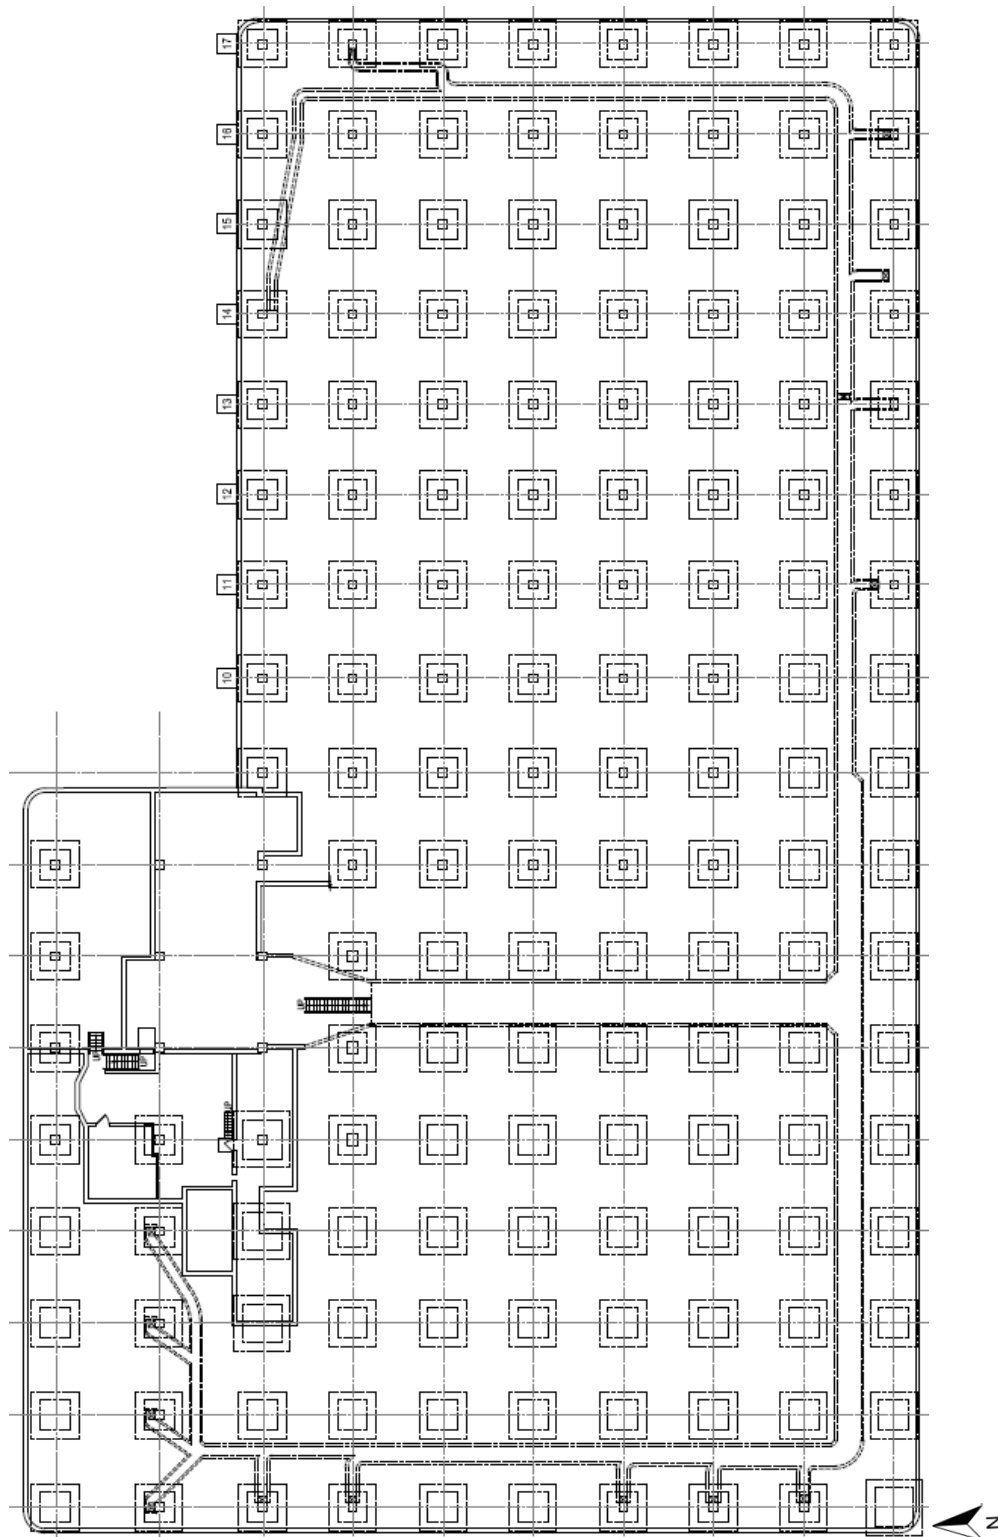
Current Sub-Basement Floor Plan (Quorum Architects). Not to Scale.
